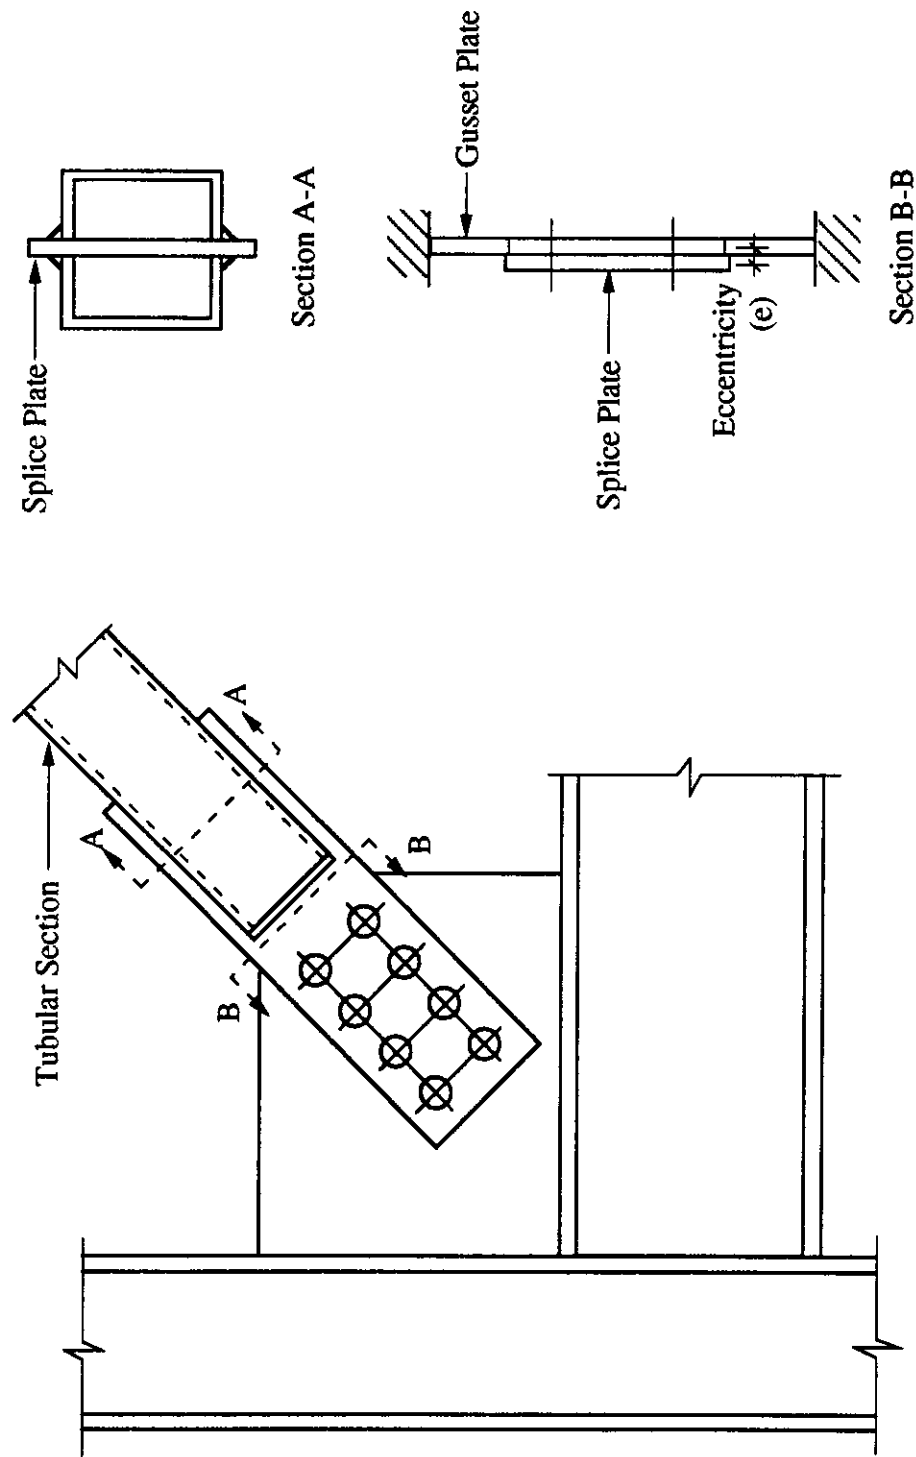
Gusset Plate Connection of Tubular Section Bracing
